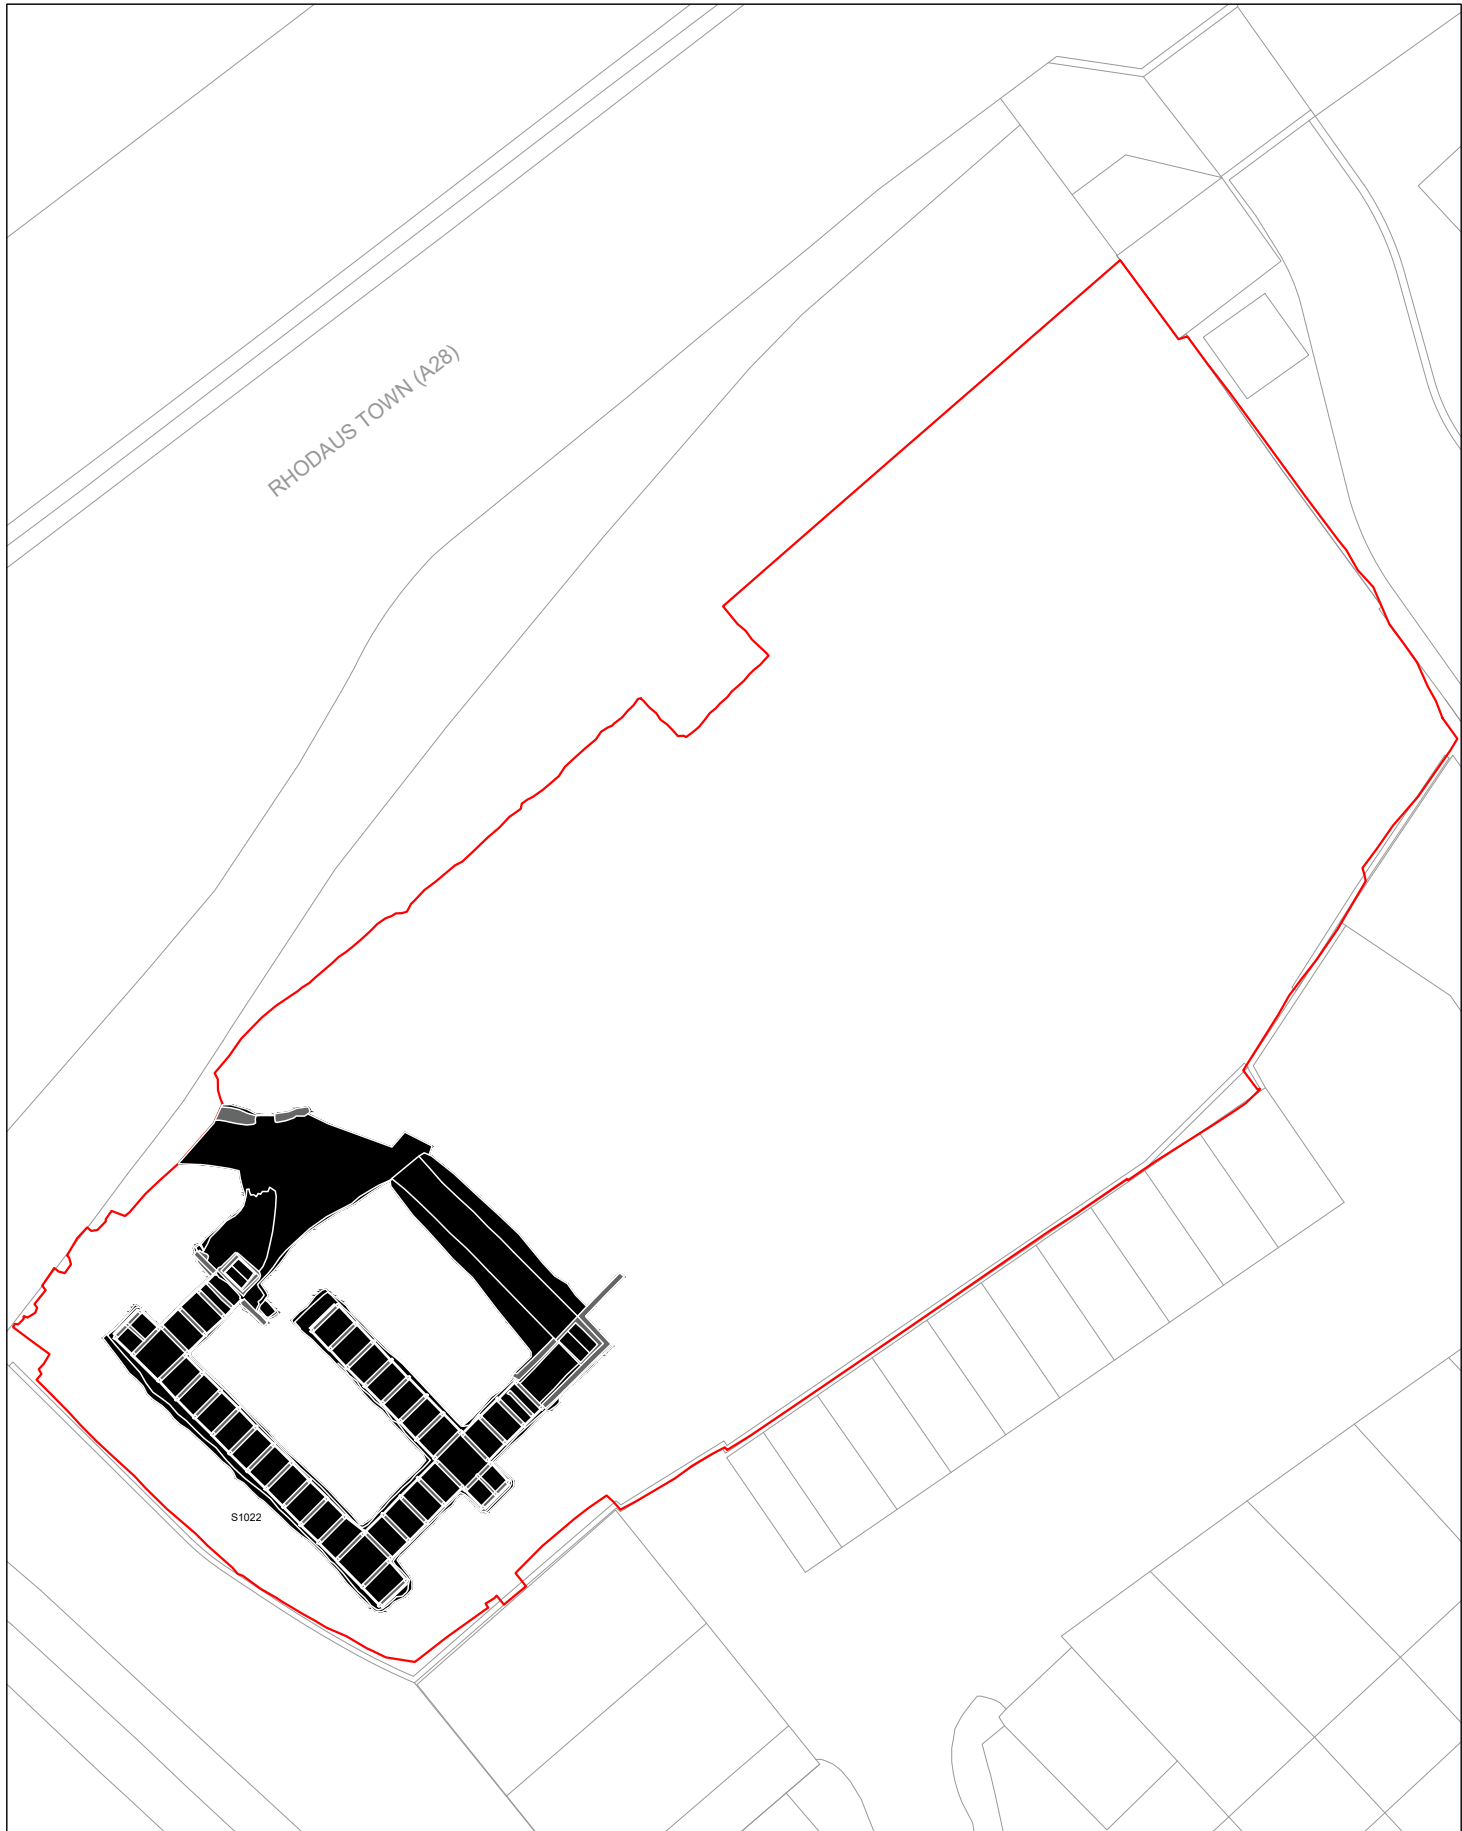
P12 Modern G35 Timber-lined air raid shelter
